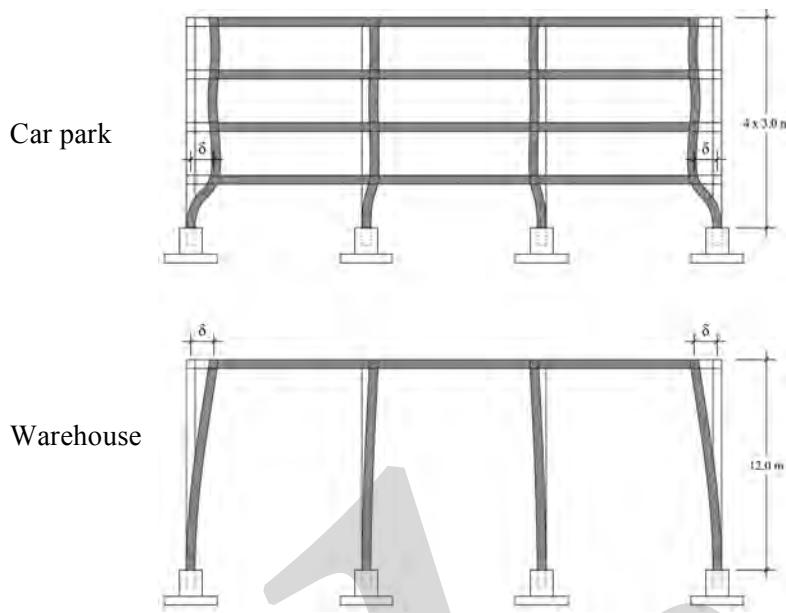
Schematic deflections of a car park and a warehouse structure of 100 m x 150 m in surface
